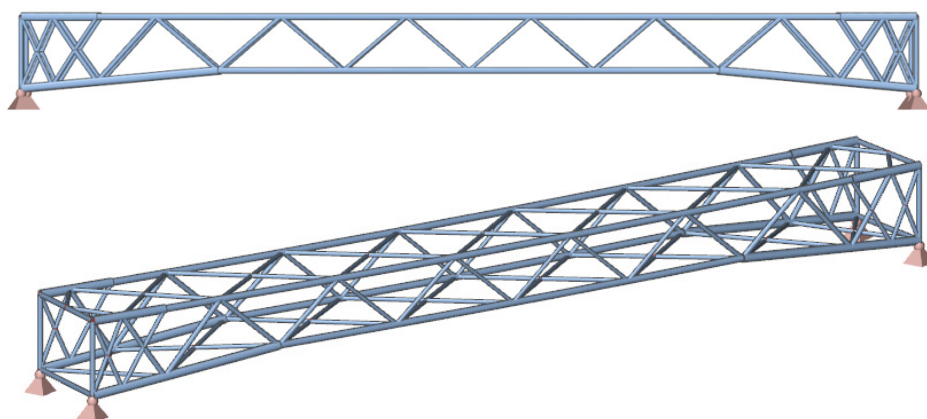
SIDE GIRDER LAYOUT: SIDE VIEW ON THE TOP, 3D VIEW ON THE BOTTOM
